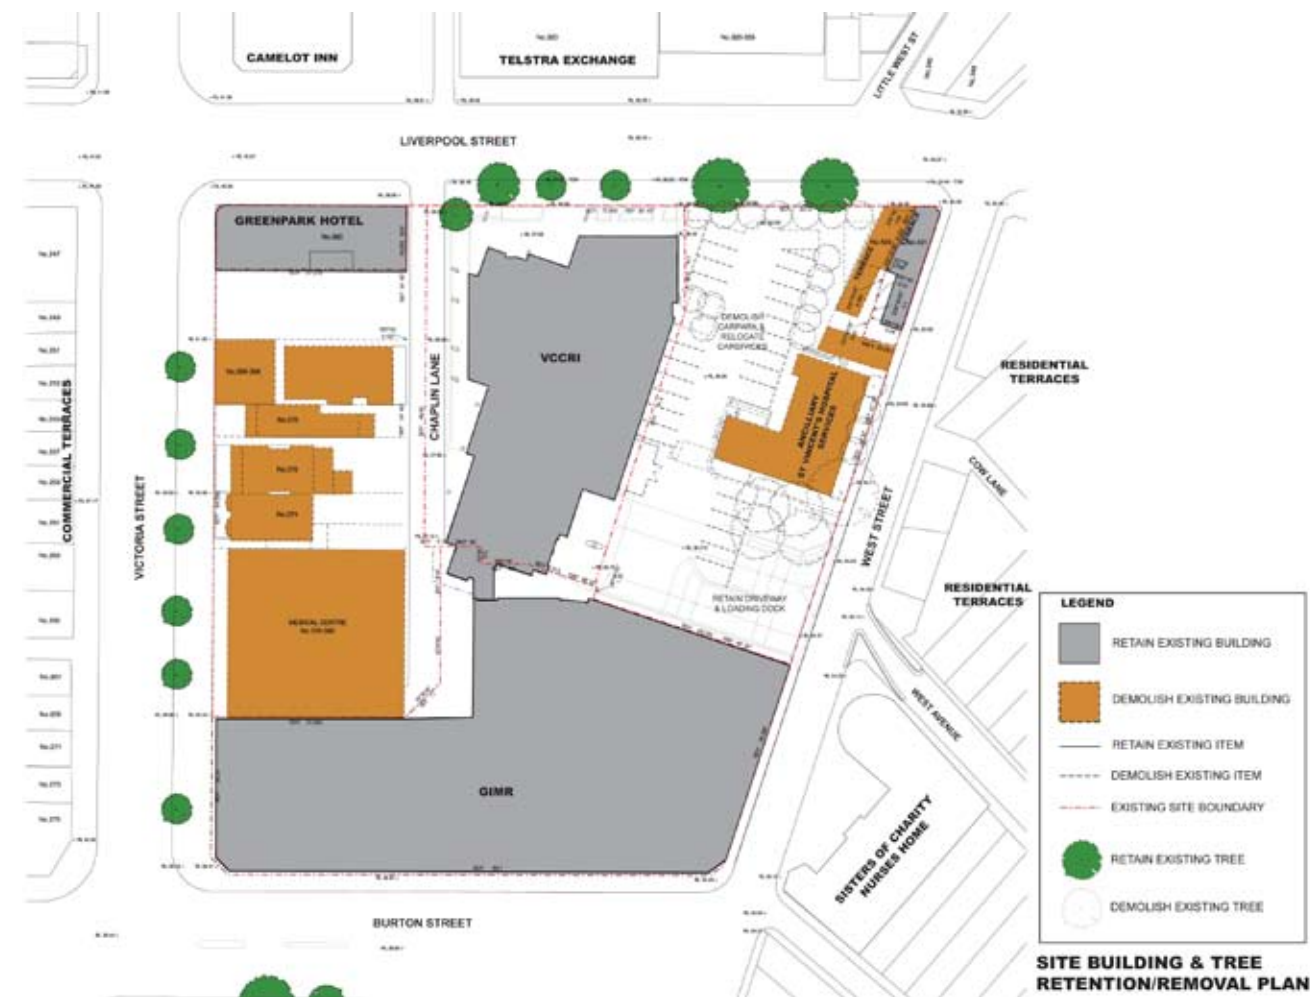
Proposed Demolition / Retention of Buildings and Trees (Source: Daryl Jackson Robyn Dyke Architecture)
